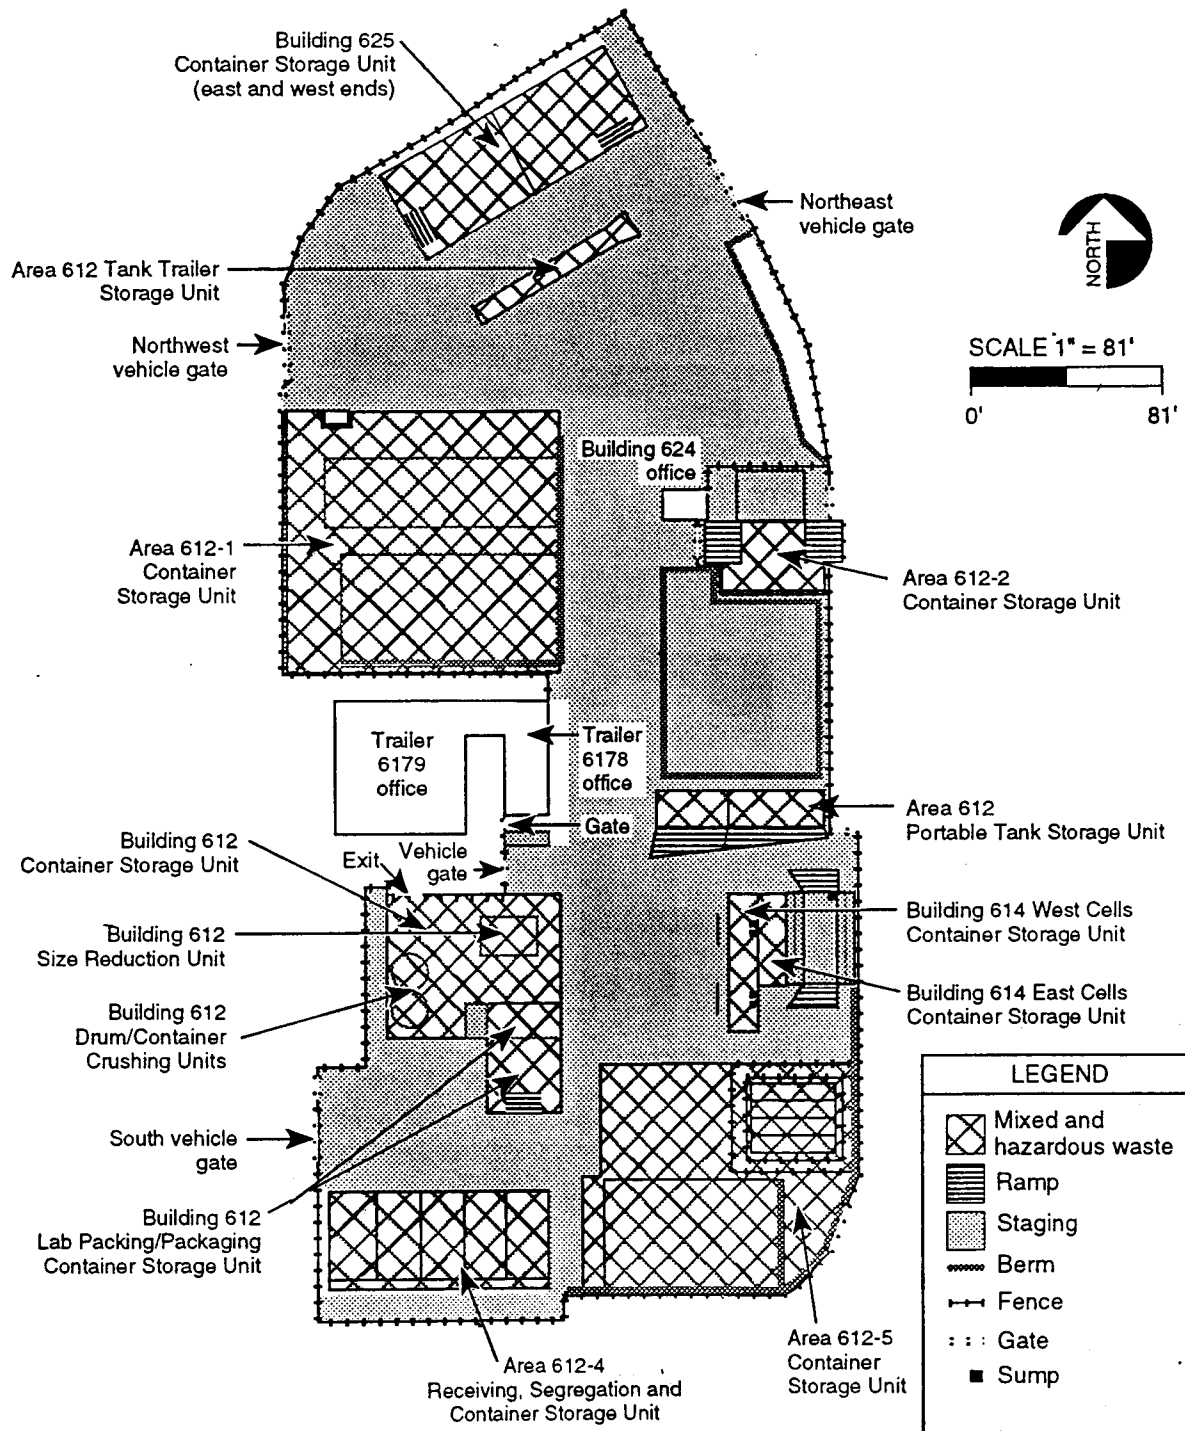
Layout of Area 612 Container Storage/Treatment Unit Group
